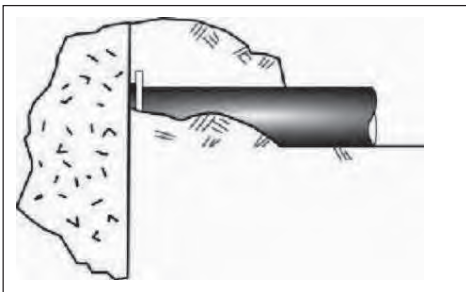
Connection to Rigid Structure Using Consolidated Earthen Berm
